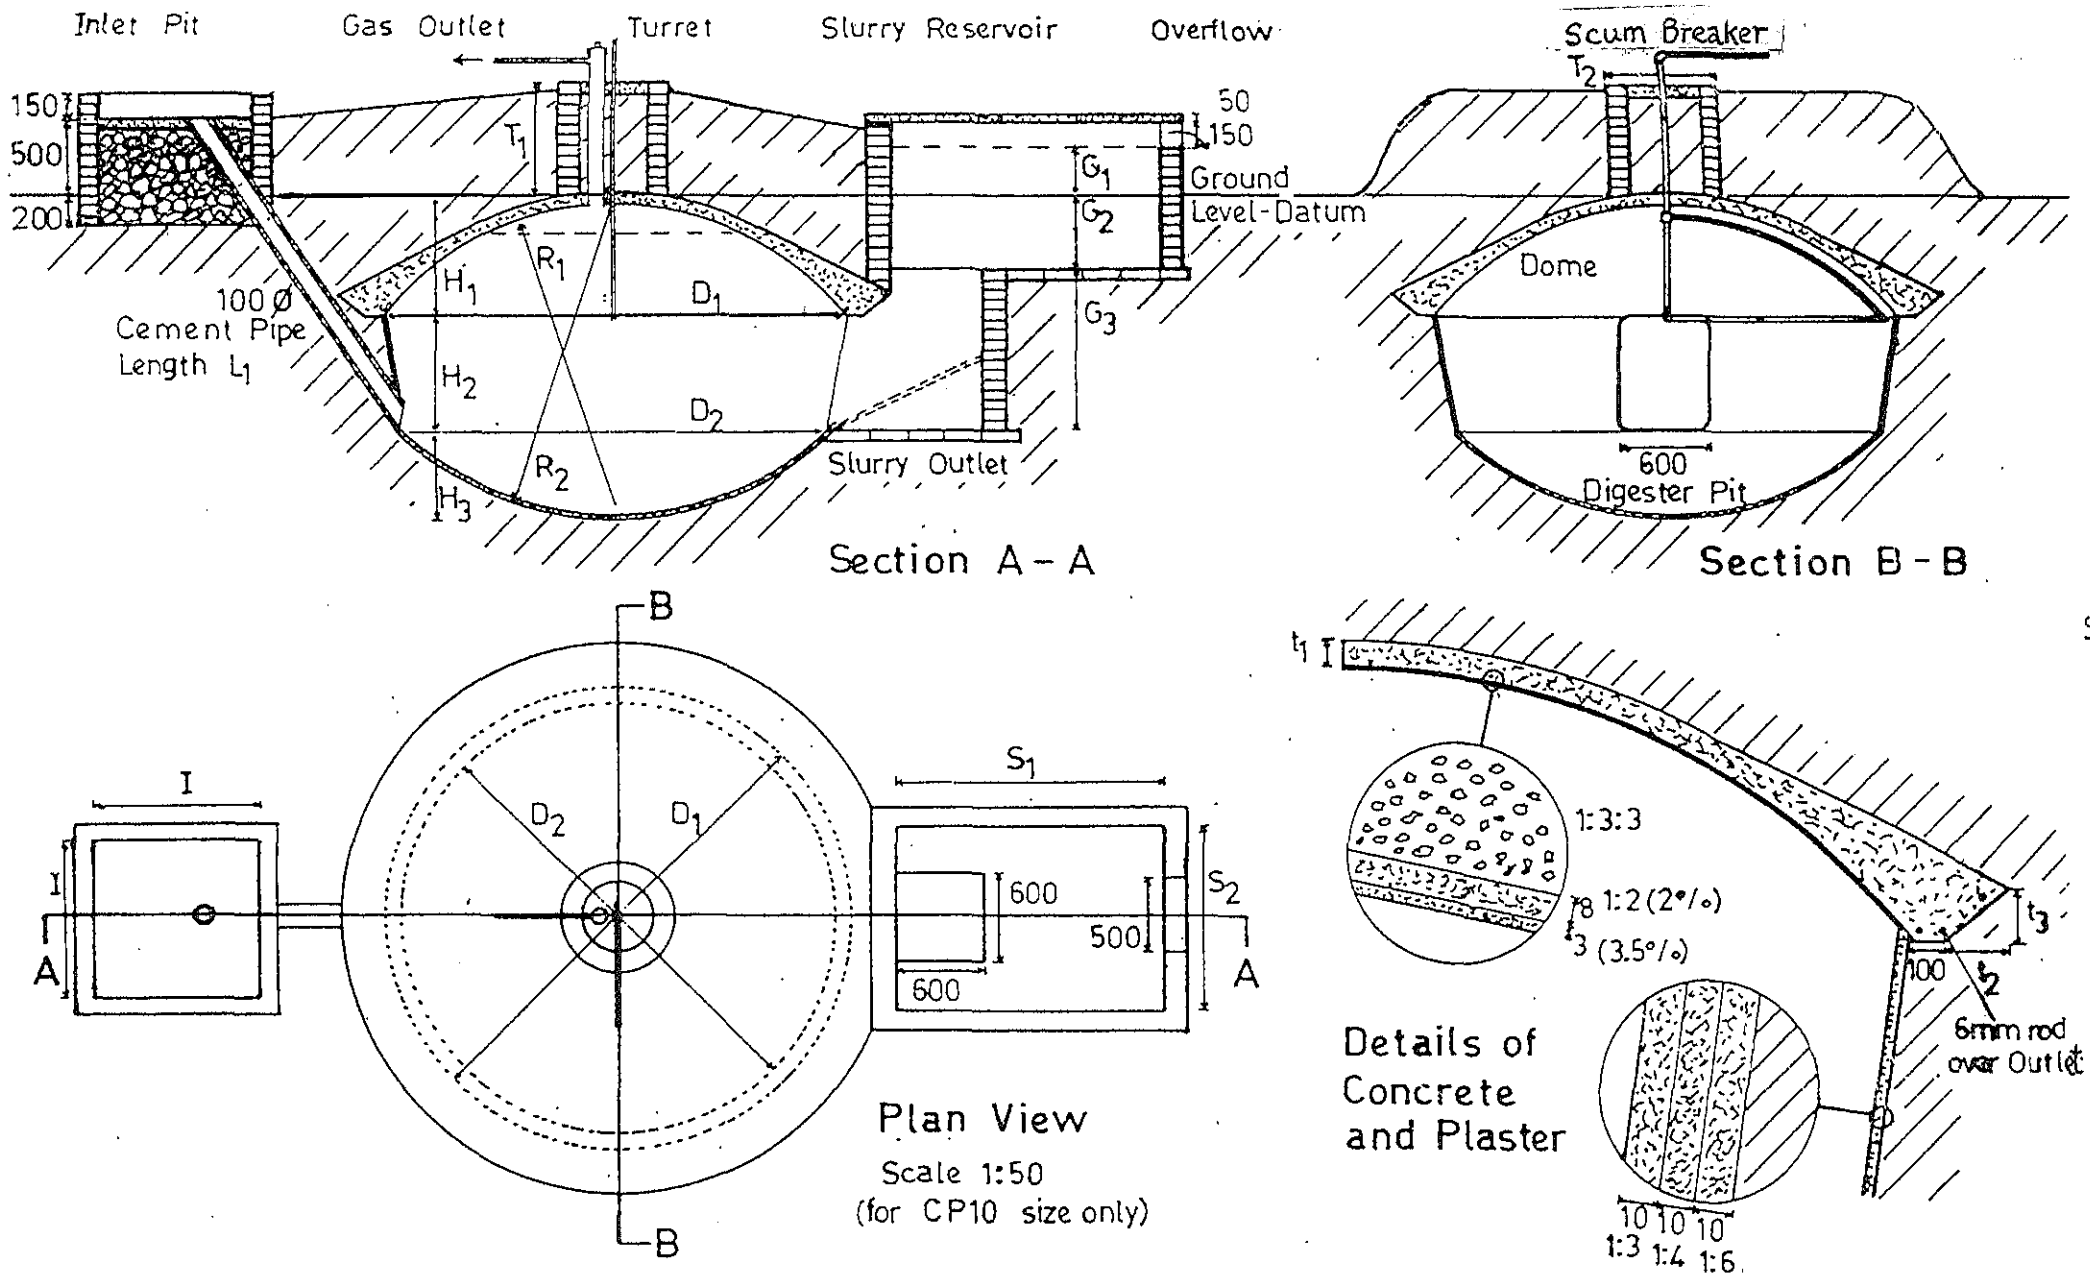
Fixed Concrete Dome Design: Construction Drawings
